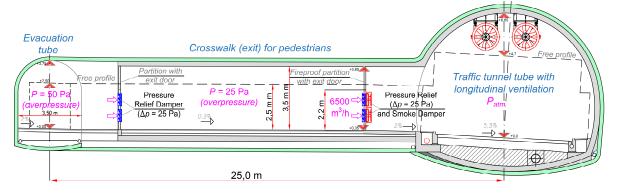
Cross-section of the traffic tunnel tube and the evacuation tunnel for pedestrians Source: CTP Projekt d.o.o.
